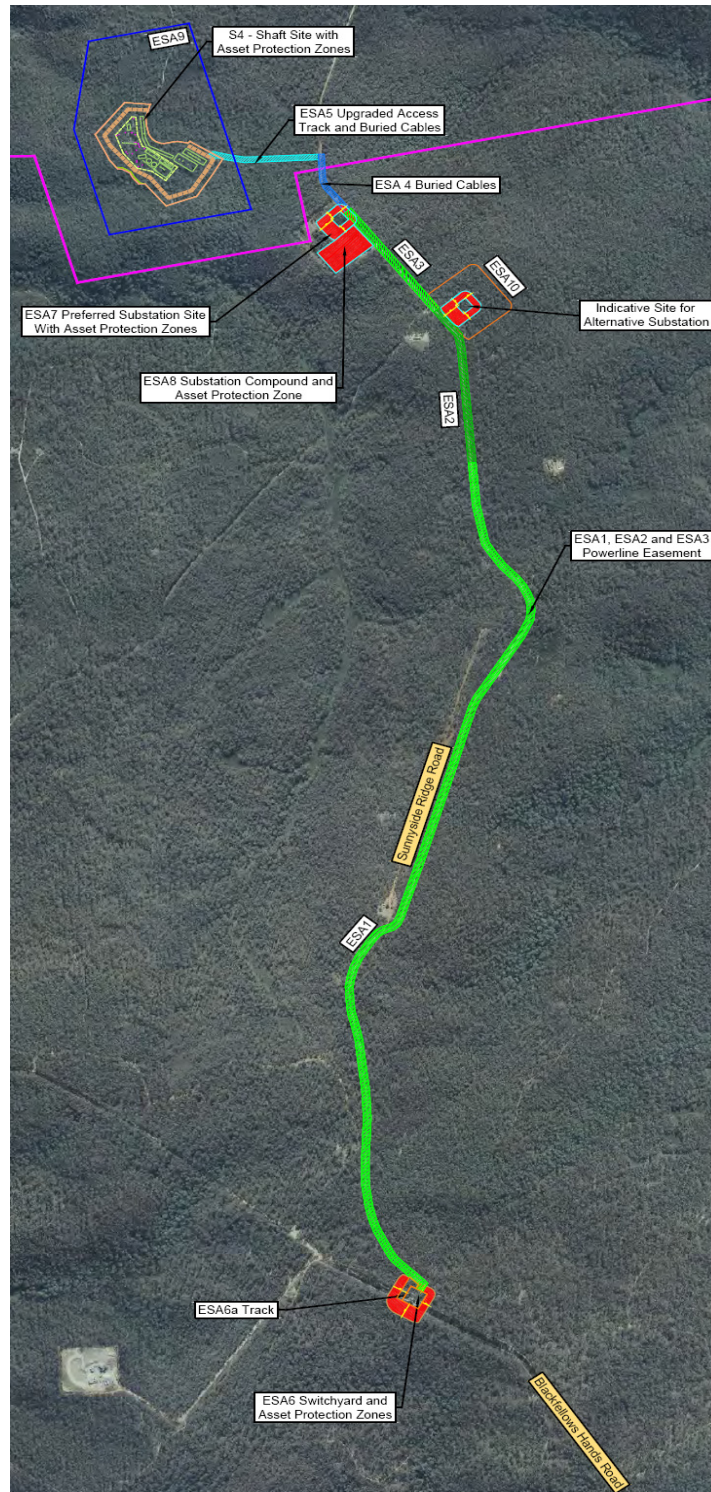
Site Plan of Angus Place Colliery Extension – Ventilation Shaft Site.
